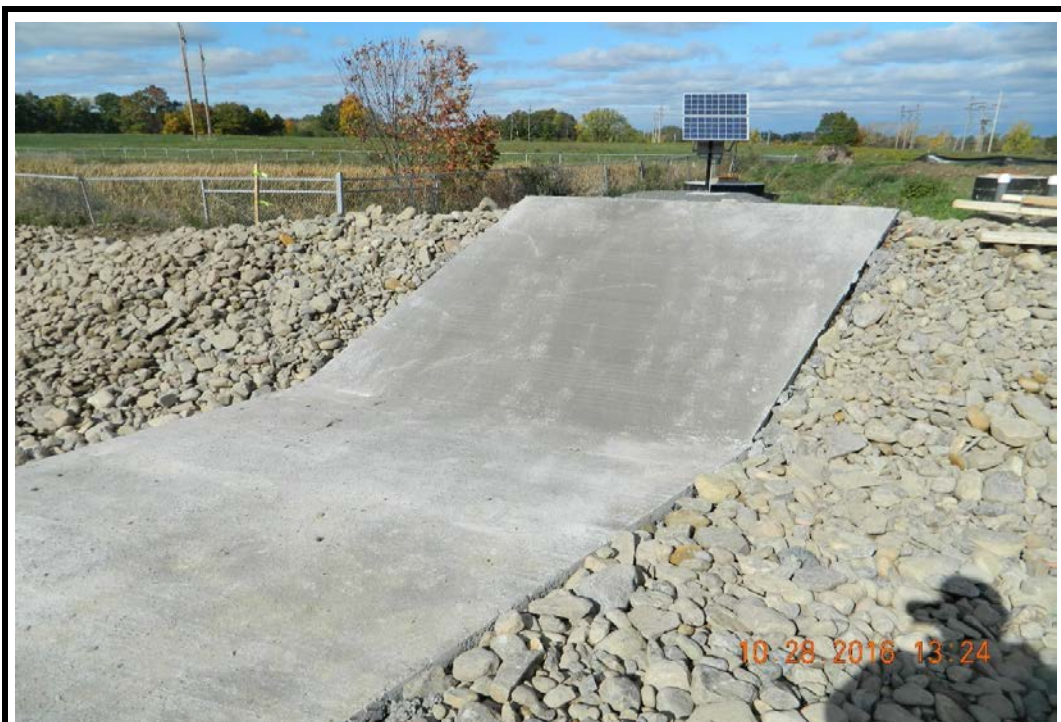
Concrete lined channel, looking northwest (10/28/16)
